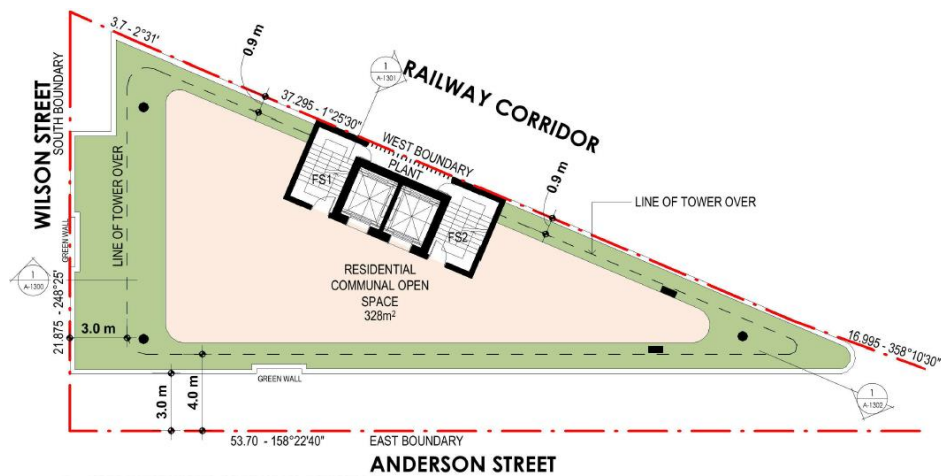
Ground floor plan (source: Drew Dickson Architects)
